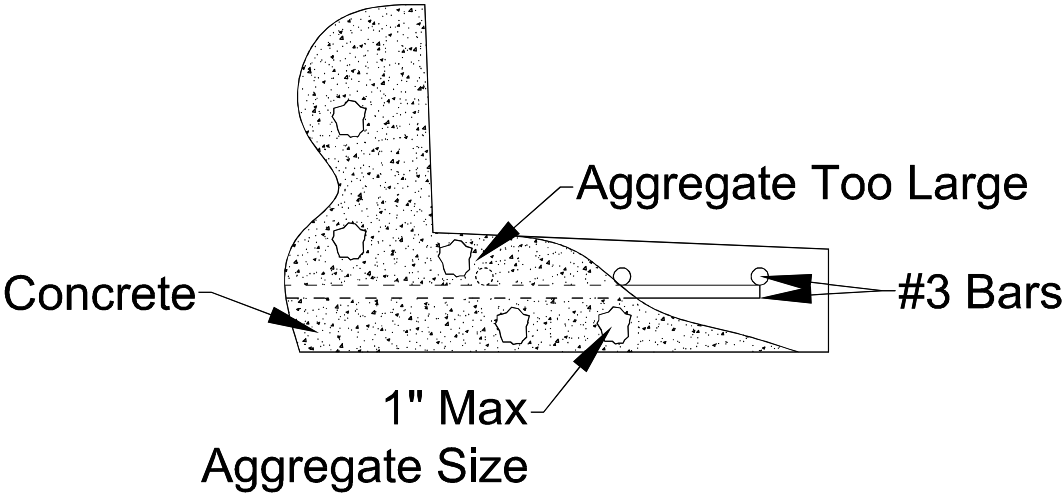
Flange of First Girder Placement Attempt (Drawing)
